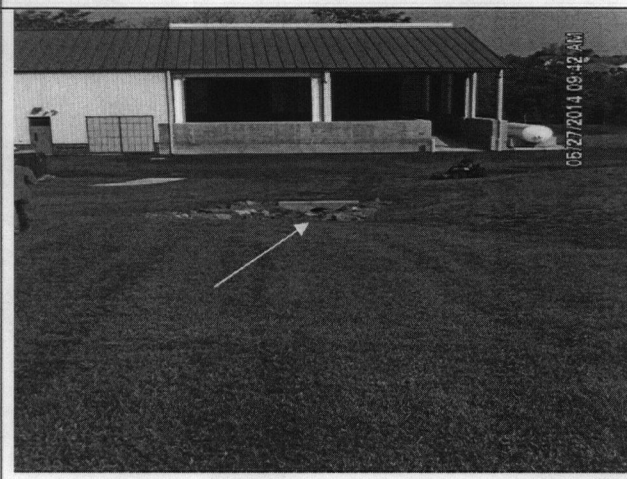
Drainage area to Outfall 001. Storm water flow enters the culvert (noted by the arrow) and travels underground until discharge. The sludge bay is in the background.
